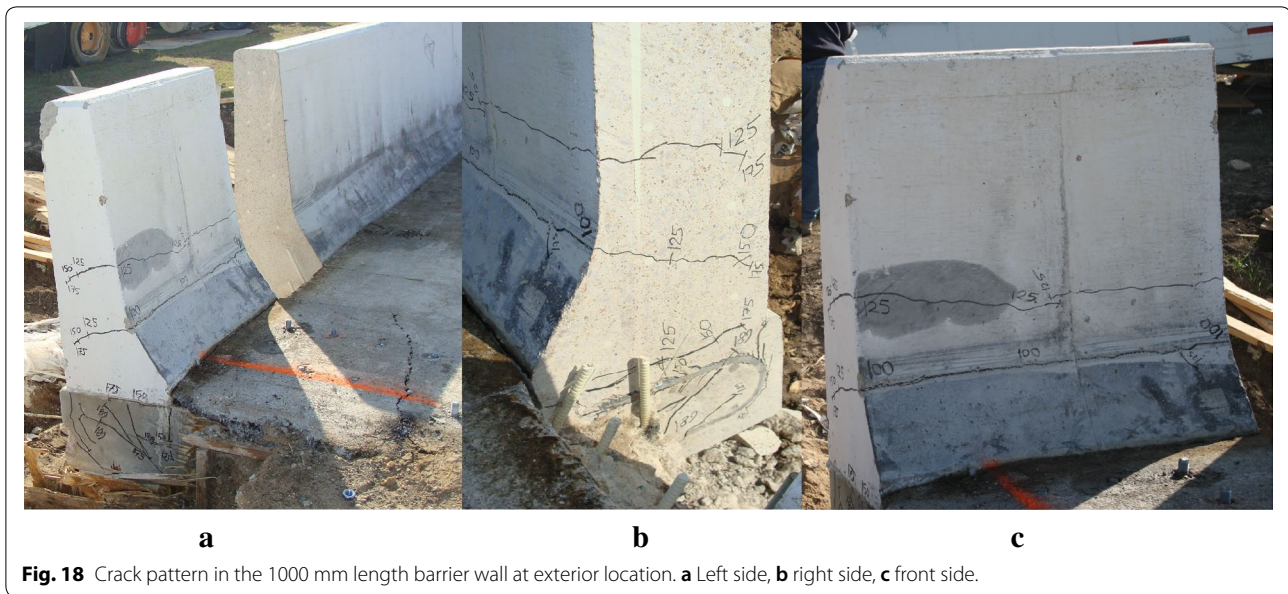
Crack pattern in the 1000 mm length barrier wall at exterior location. a Left side, b right side, c front side.
